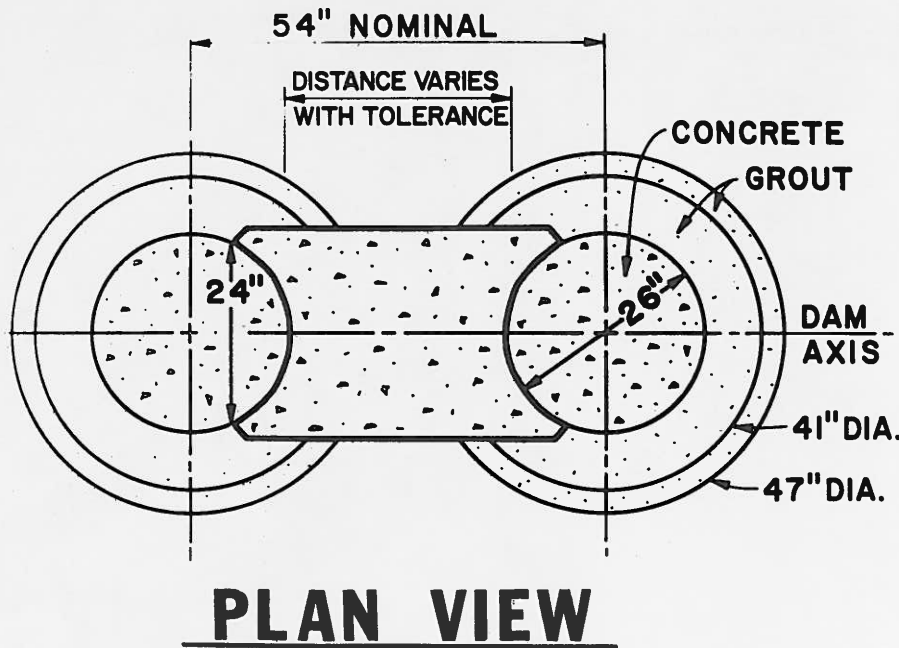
PLAN OF INTERLOCKING PRIMARY AND SECONDARY ELEMENTS.
